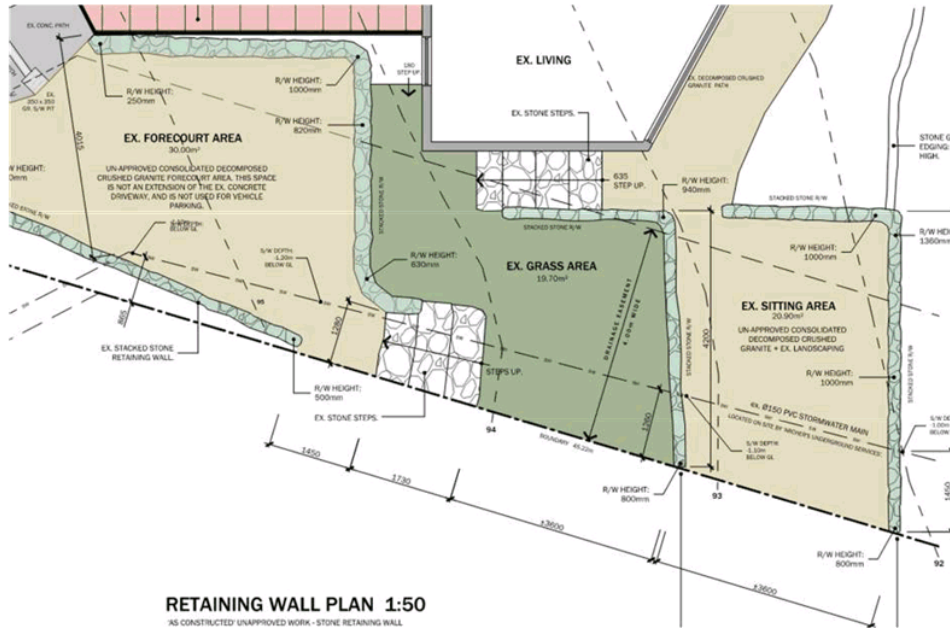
(section of) the retaining wall running parallel to the side boundary shared with 121 Woodcutters Road and retaining walls within the property creating seating/sitting terraces
